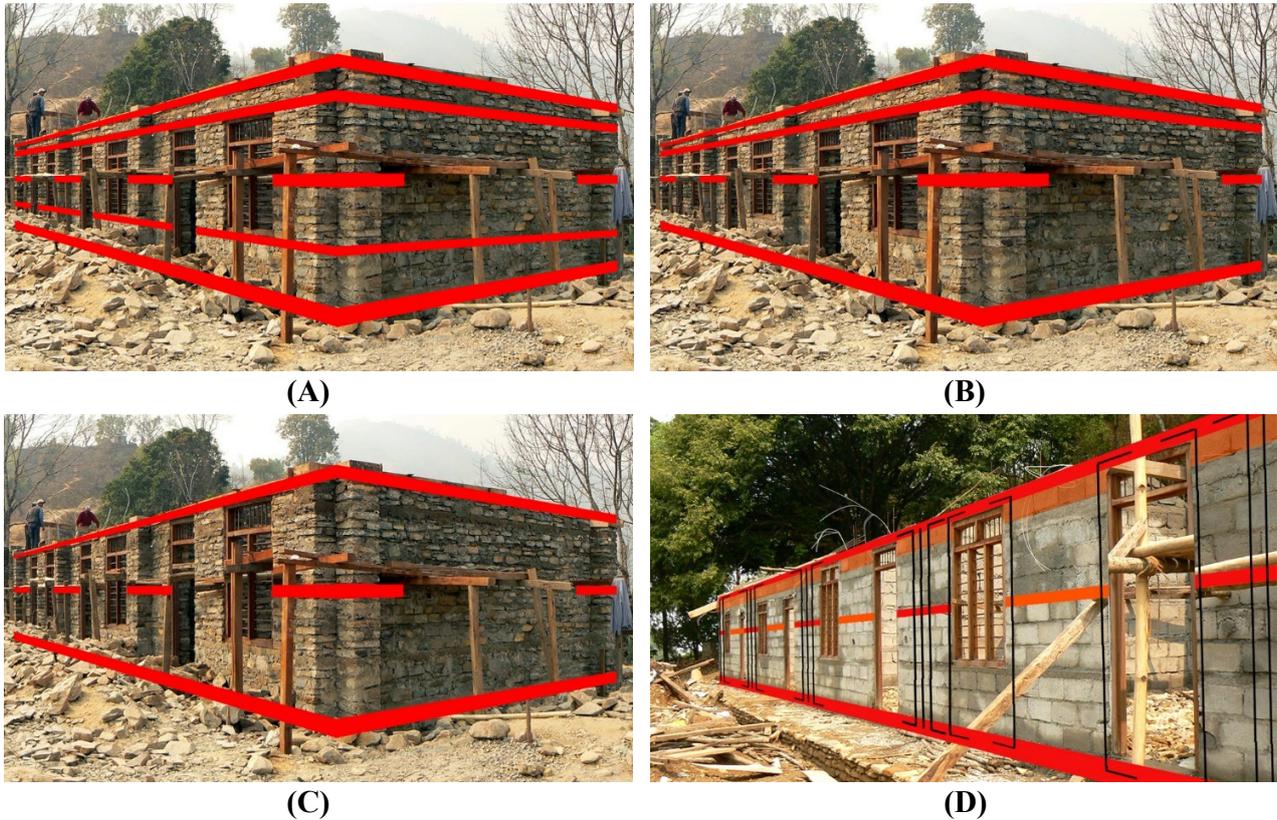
Horizontal reinforcements in rubble stone masonry walls, at: (A) 5 levels; (B) 4 levels; (C) 3 levels; and (D) Horizontal beams in concrete block masonry at 3 levels (all by courtesy of Smart Shelter Research).
